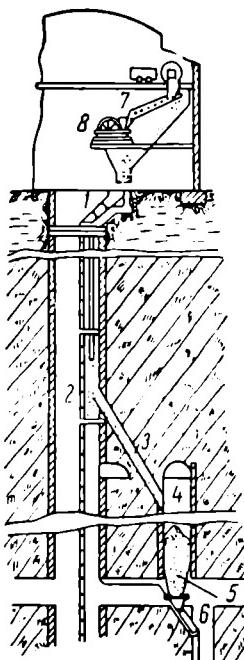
Underground arrangement of mixing plants with hydraulic filling
